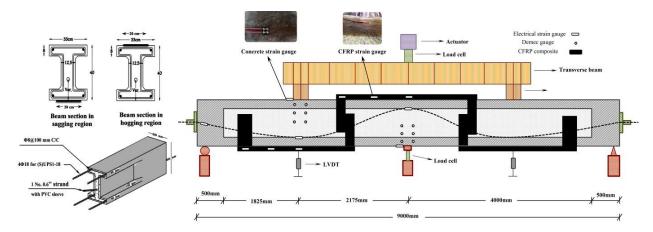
Beam details and measurement schemes for SUPS test specimen
